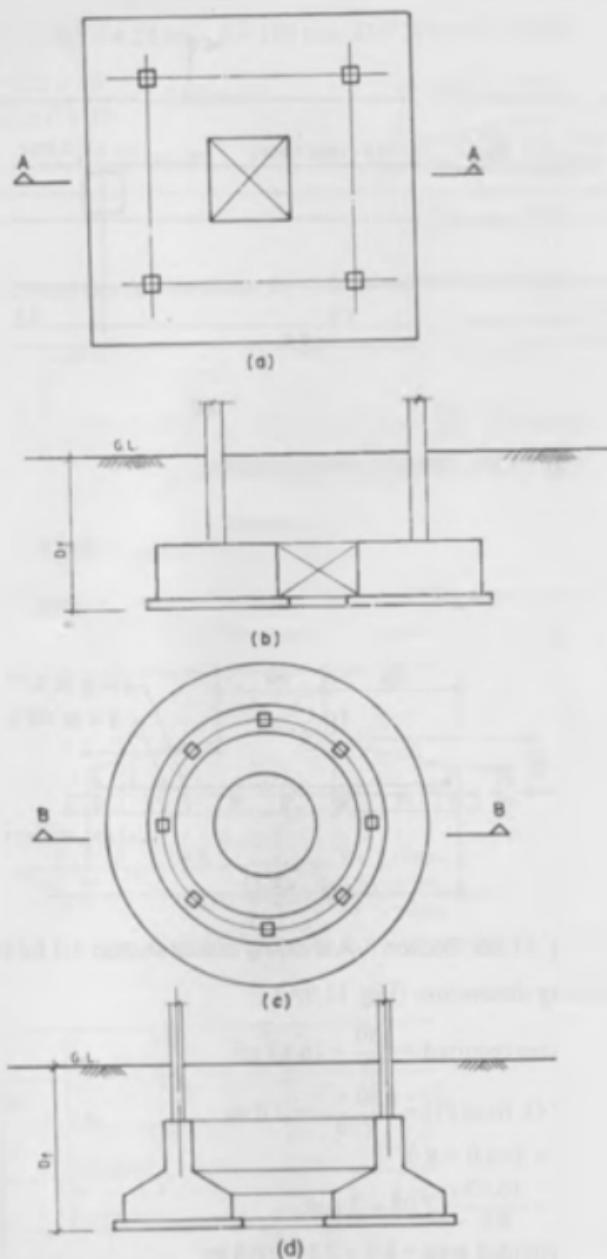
Annular raft foundation. (a) Plan with soil capacity high; (b) Section A-A. (c) Annular raft for a tower; (d) Section B-B.
